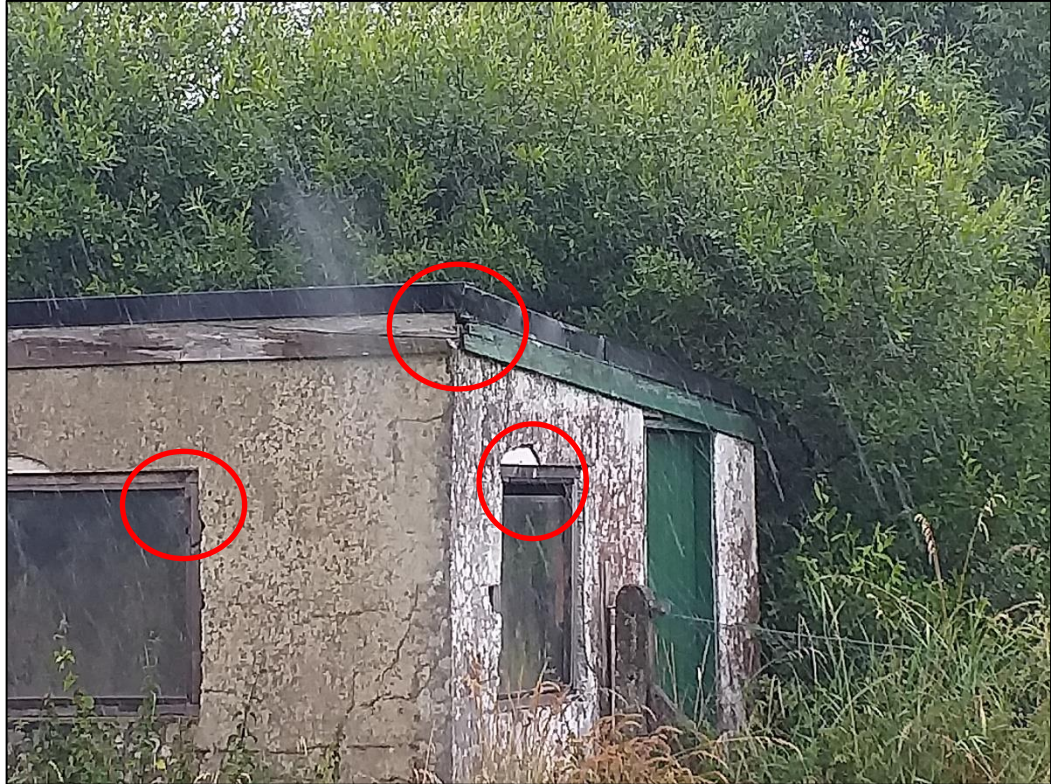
Old Shed/outhouse with hole in fascia board on southwest corner of structure and gaps and cracks in render and around window frames
